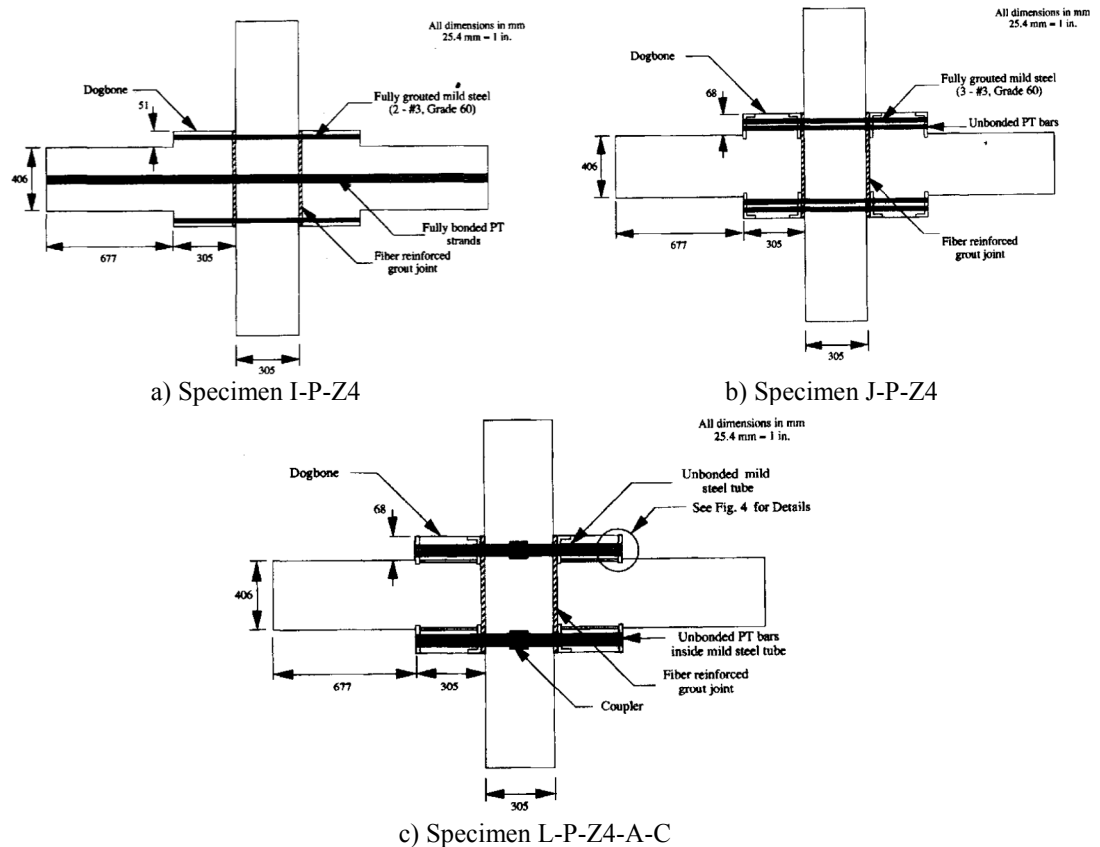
Precast Hybrid Rocking Beam-Column Specimen Details (Scott, 1996)
